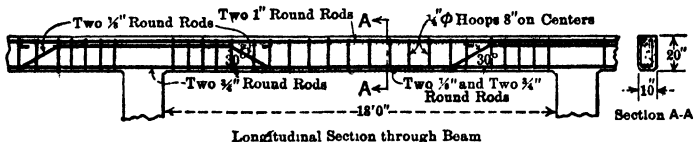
Typical Design of a Fully Continuous Rectangular Beam, Under a Uniformly Distributed Load and with Compression Reinforcement
